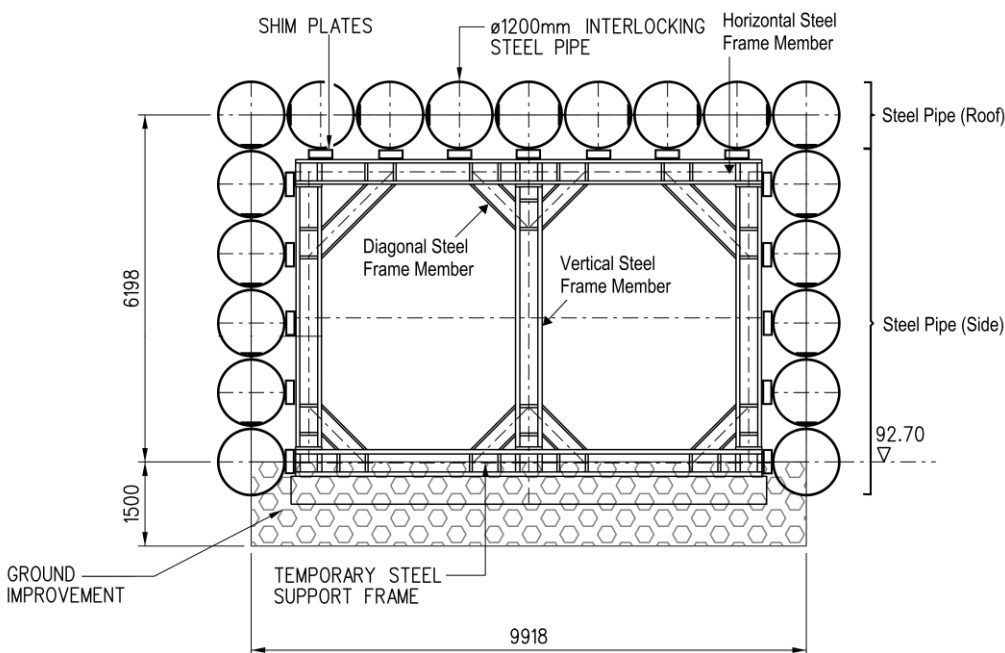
Cross section of proposed 3-sided pipe roof system for underground linkway construction
